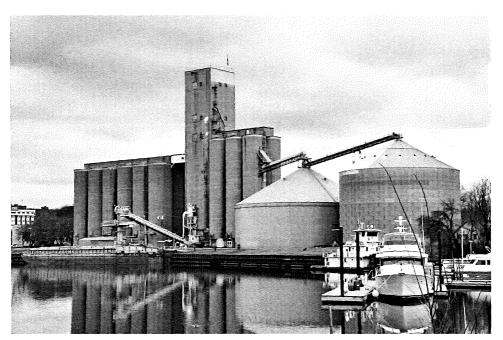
810 Levee Rd. Burdick Grain Co. Terminal Elevator, north (river) side with gableroofed steel shed to left of barge-loading spout and two steel bins (facing SE)
